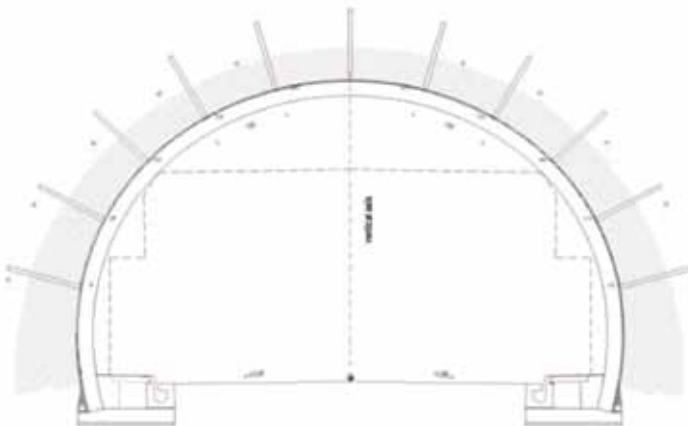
The measure of controlled collection and drainage of back-ground water by drainage bore holes.
